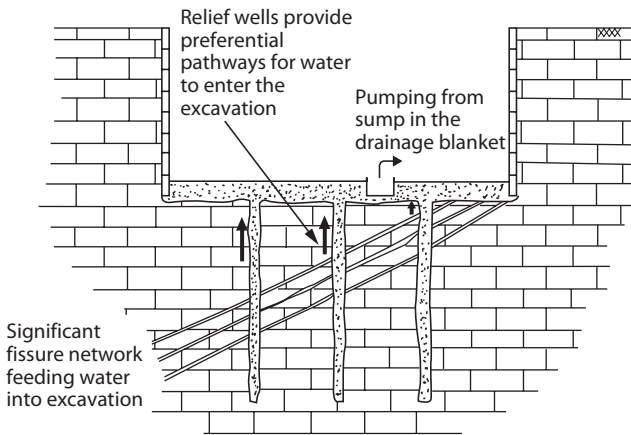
Relief wells used in rock excavations to intercept flow in discrete fissures.
